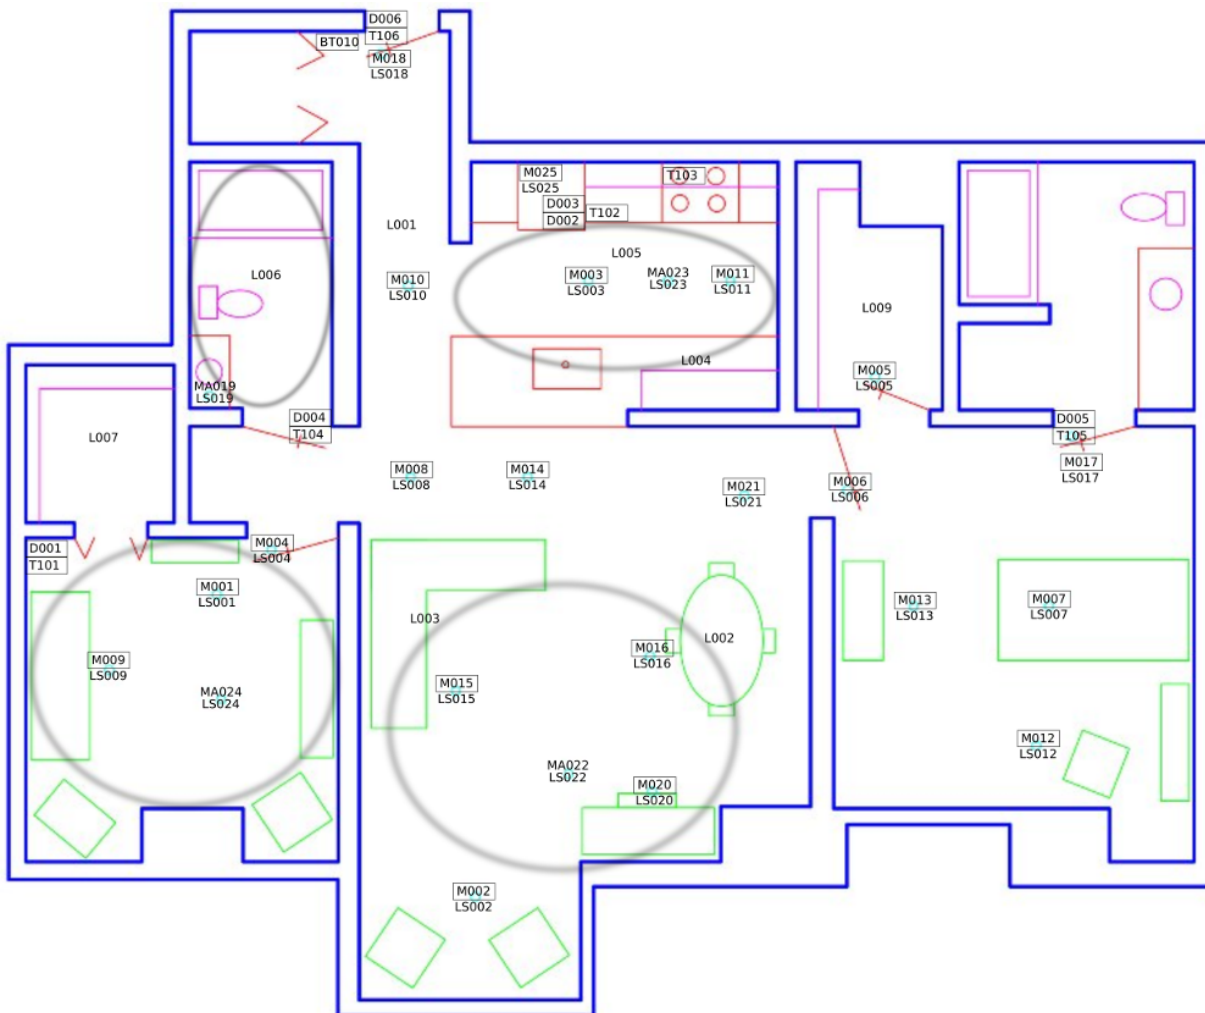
Floor plan and sensor placement for the testbed hh106.
